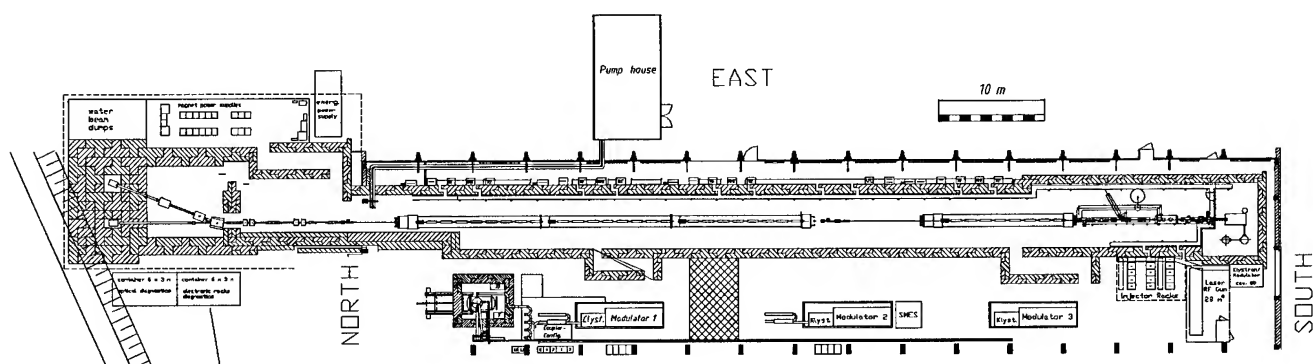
Plan View of the TESLA Test Facility Linac Layout.
